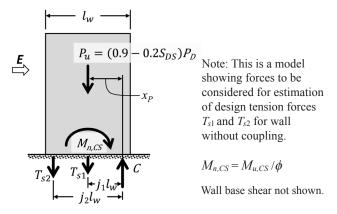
Model for initial selection of flexural tension reinforcement.
